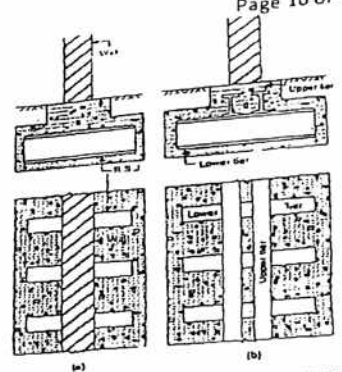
STEEL GRILLAGE FOUNDATIONS FOR WALLS.
